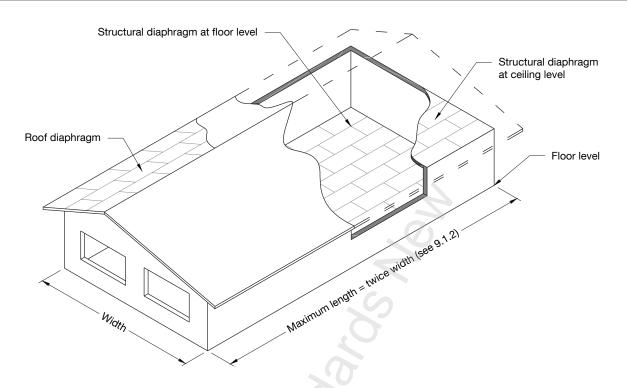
Structural diaphragm support systems (see 8.4.2(b))
